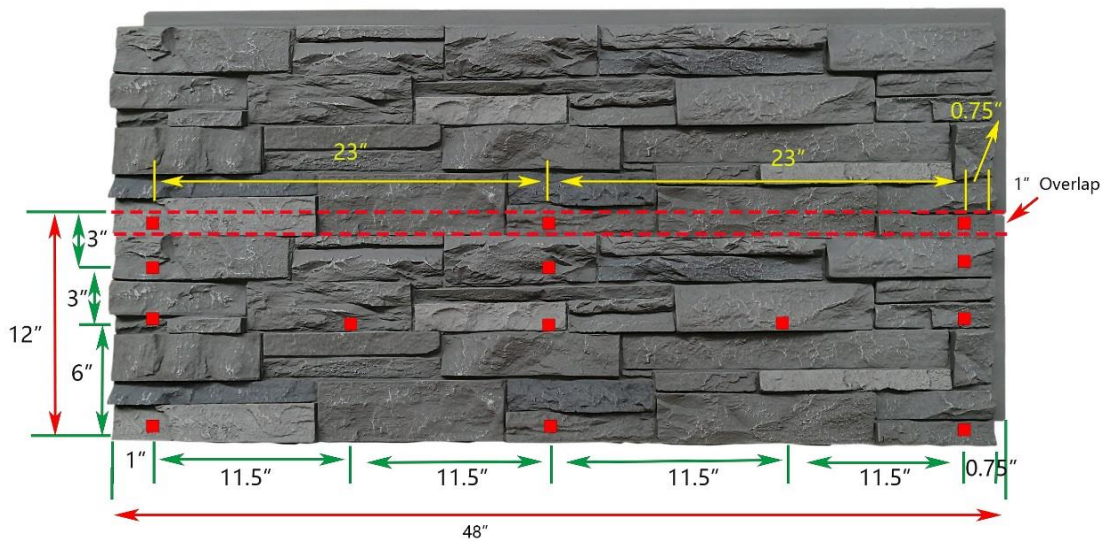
Location of nails to fix the panel to the OSB sheathing board
